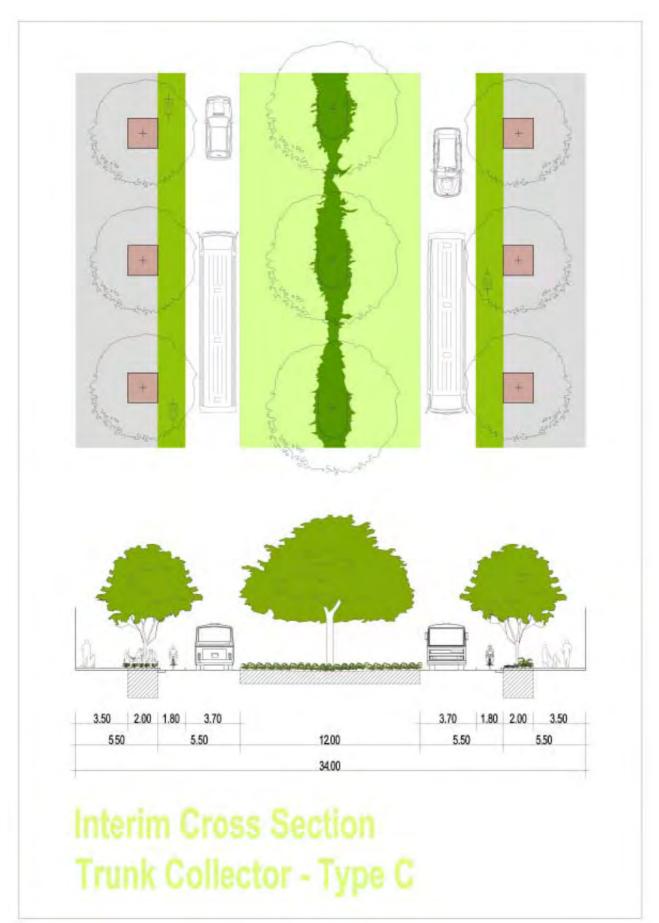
(c)(i) Trunk Collector Road Type C Interim Cross Section
